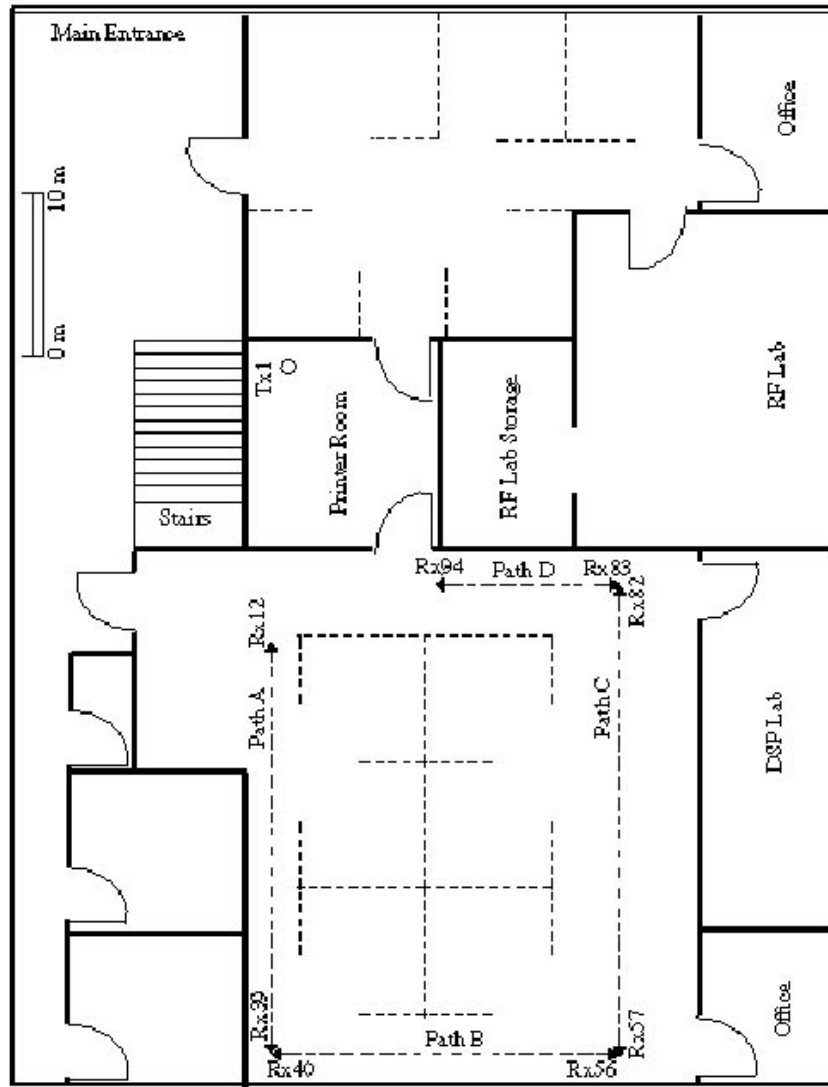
Floor plan of MPRG first floor used for indoor measurements
